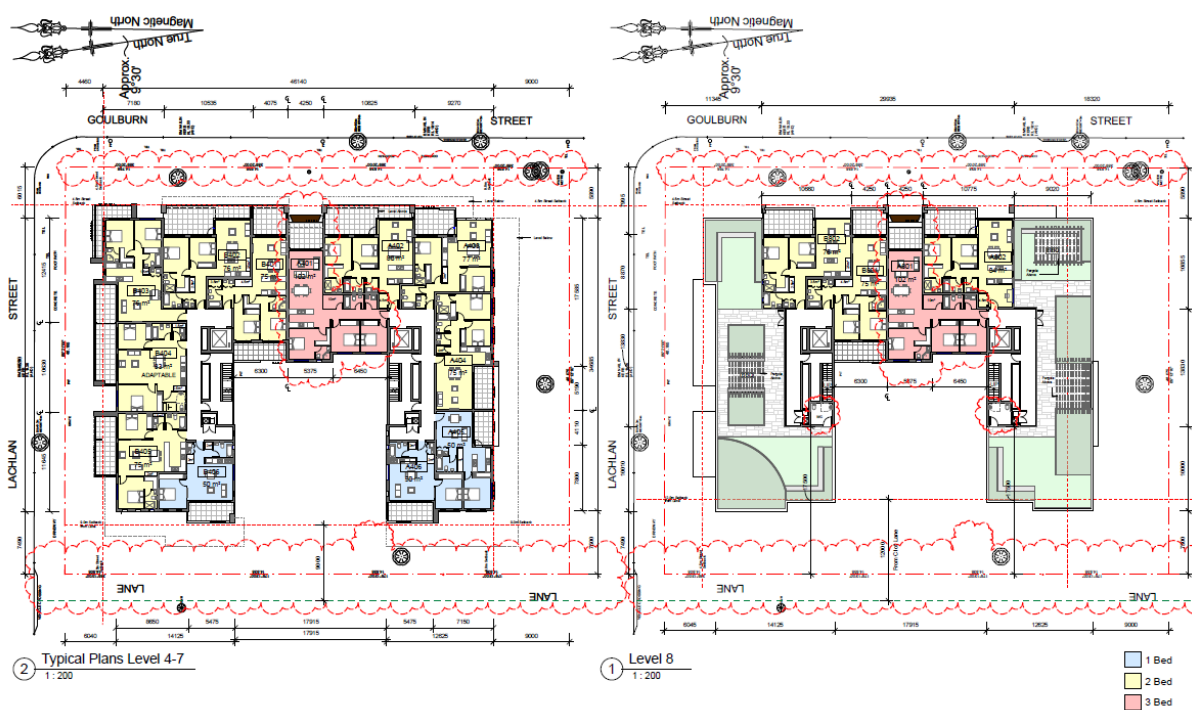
View of Levels 4-8 of the original proposal, consisting of a 9-storey building facing Goulburn St and an 8-storey north and south wings facing Goulburn Lane with rooftop communal open space on top of the 8-storey wings.
